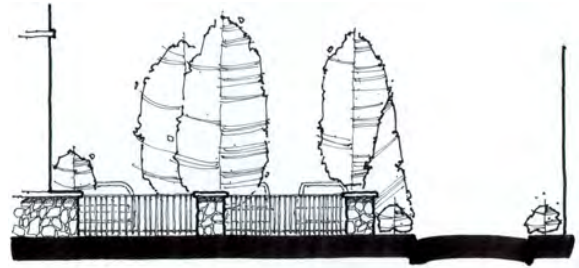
Any parking on the sides of buildings near the public street shall be screened with a decorative fence or wall or landscape screen extended at the building line to continue the street wall formed by the building line.
